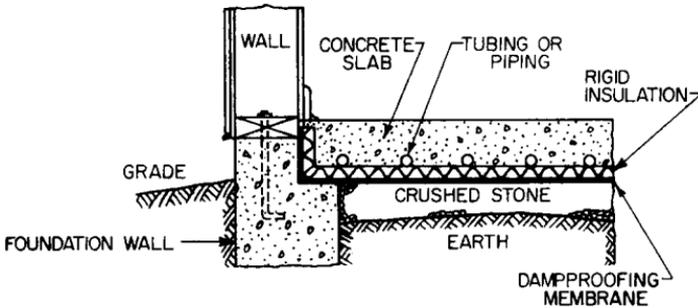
Pipe coil for radiant heating embedded in a floor slab on grade.
